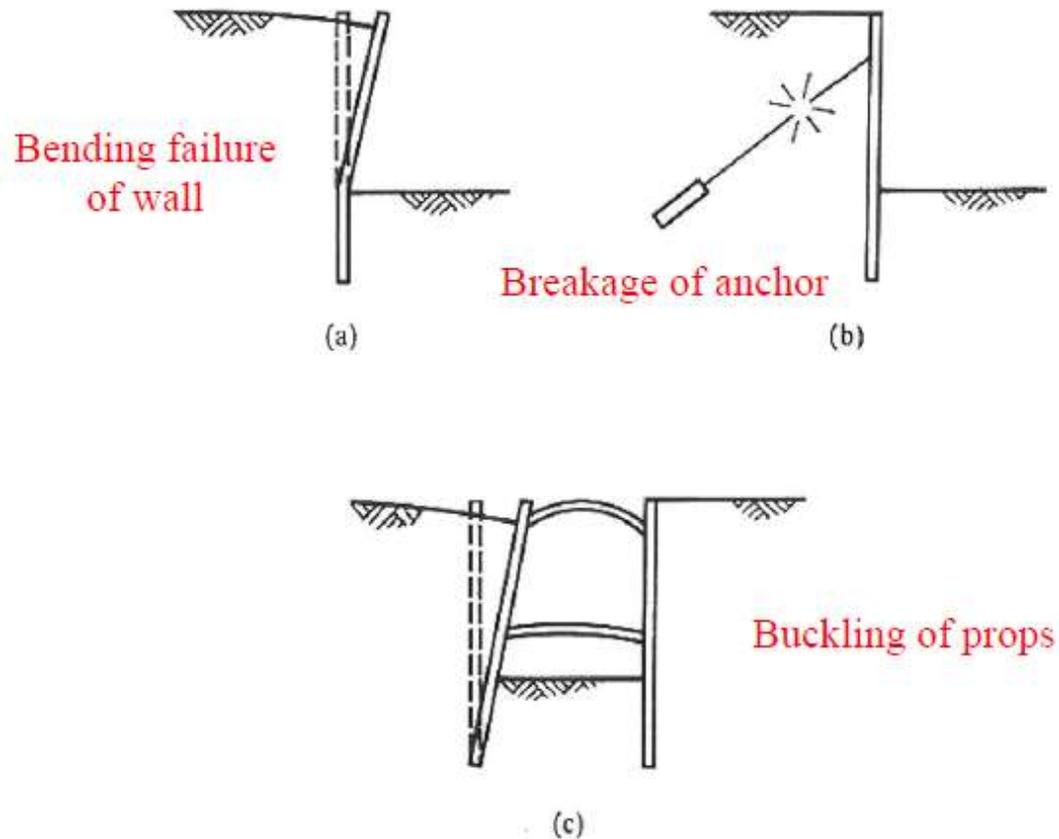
Structural failures of retaining walls ( Atkinson, 1993)
